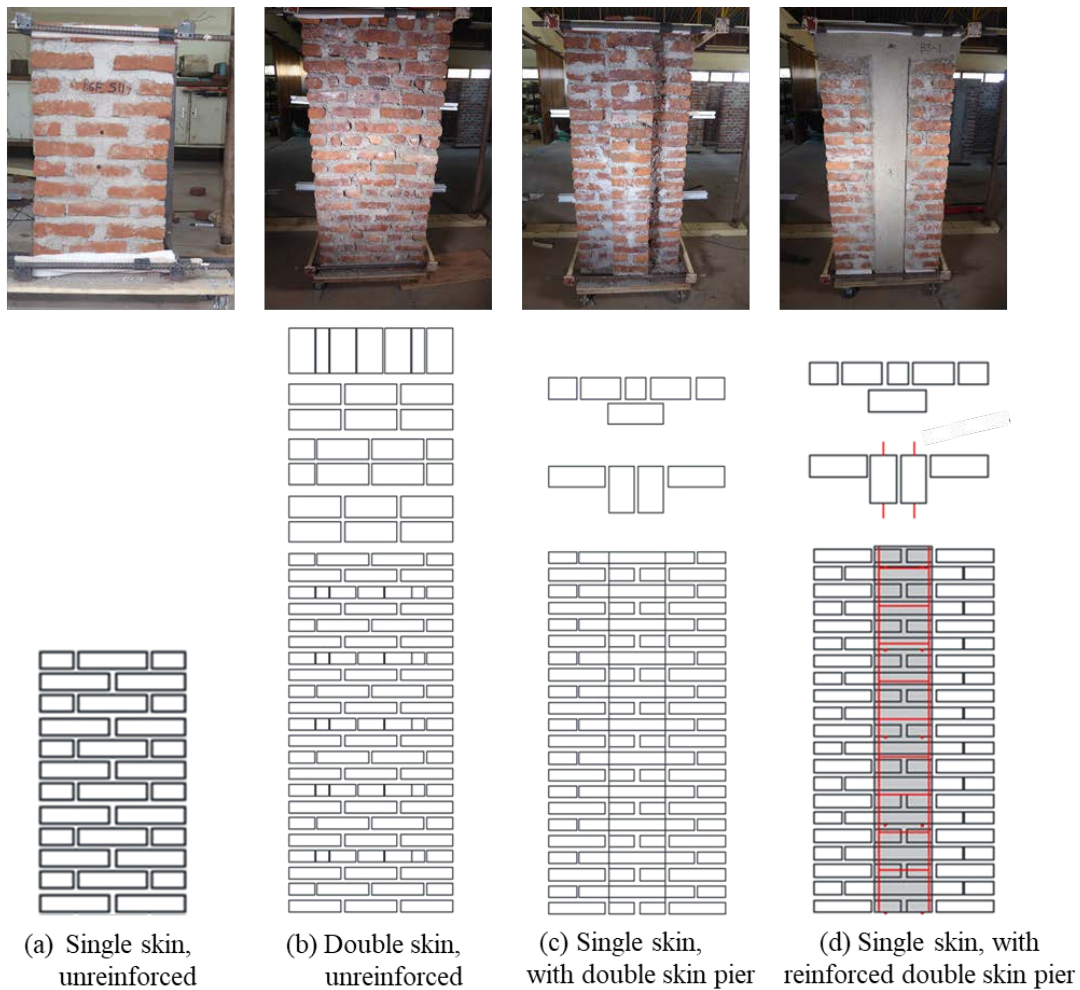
Types of panels and reinforcement tested out-of-plane/parallel.
